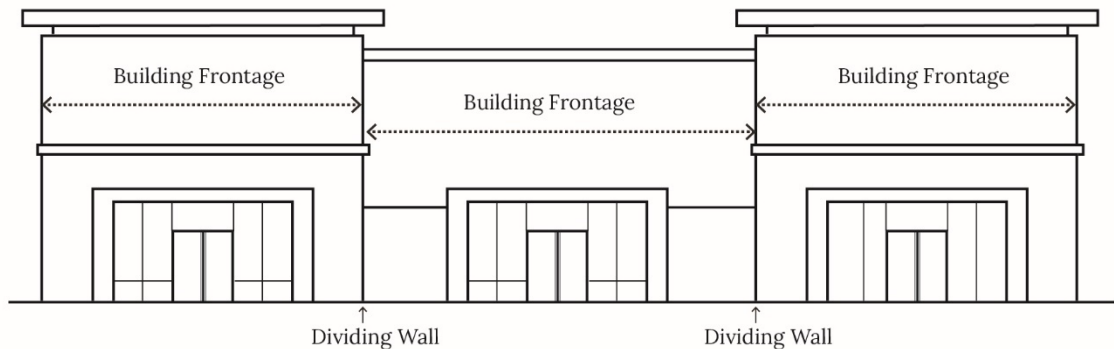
Illustration of Building Frontage for Multi-Occupant Building
